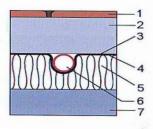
b. Dry floor structure type B 1 – floor covering, 2 – weight bearing and thermal diffusion layer (screed), 3 – splitting foil layer (vapour barrier), 4 – heat conducting plate (device) 5 – thermal insulation, 6 – pipe coil, 7 – building structure.
